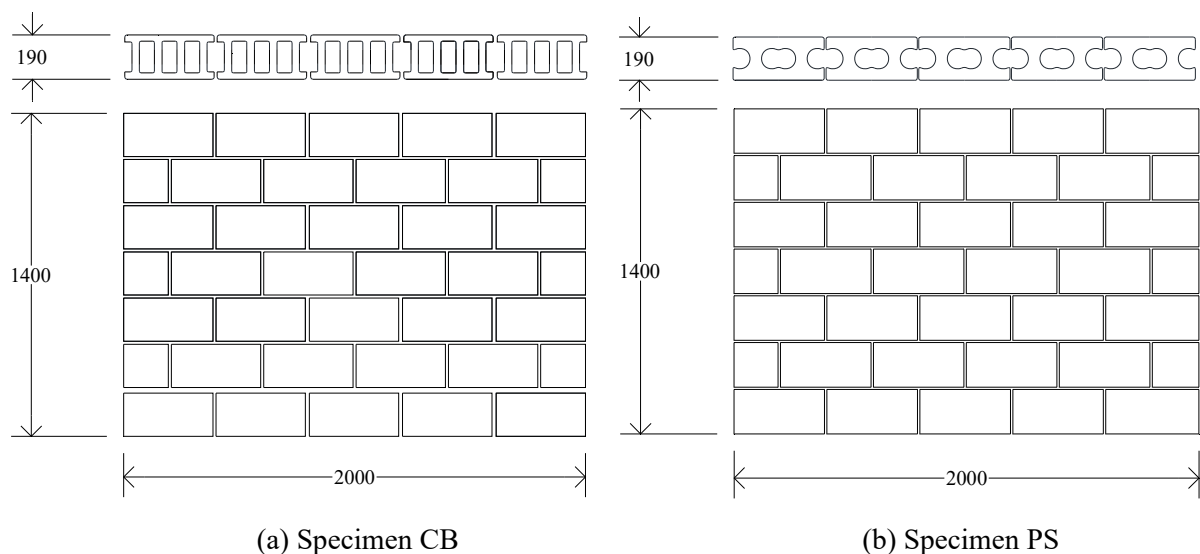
Details of typical and proposed concrete block wall specimens (unit: mm)
